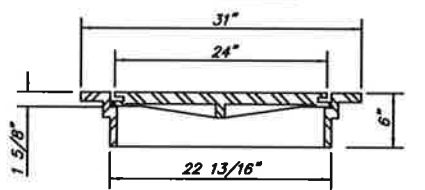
DETAIL - INLET/JUNCTION BOX GRADE ADJUSTMENT
